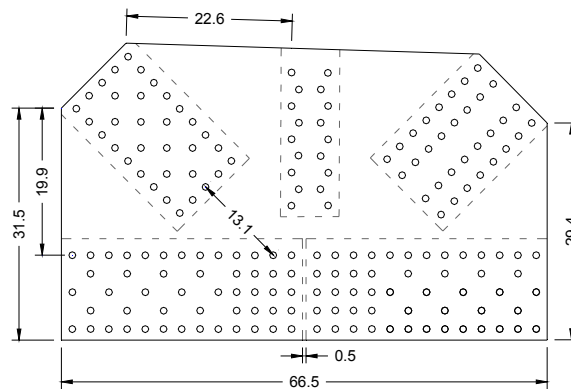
Dimensions in inches for SL3 and SL4 specimens.
